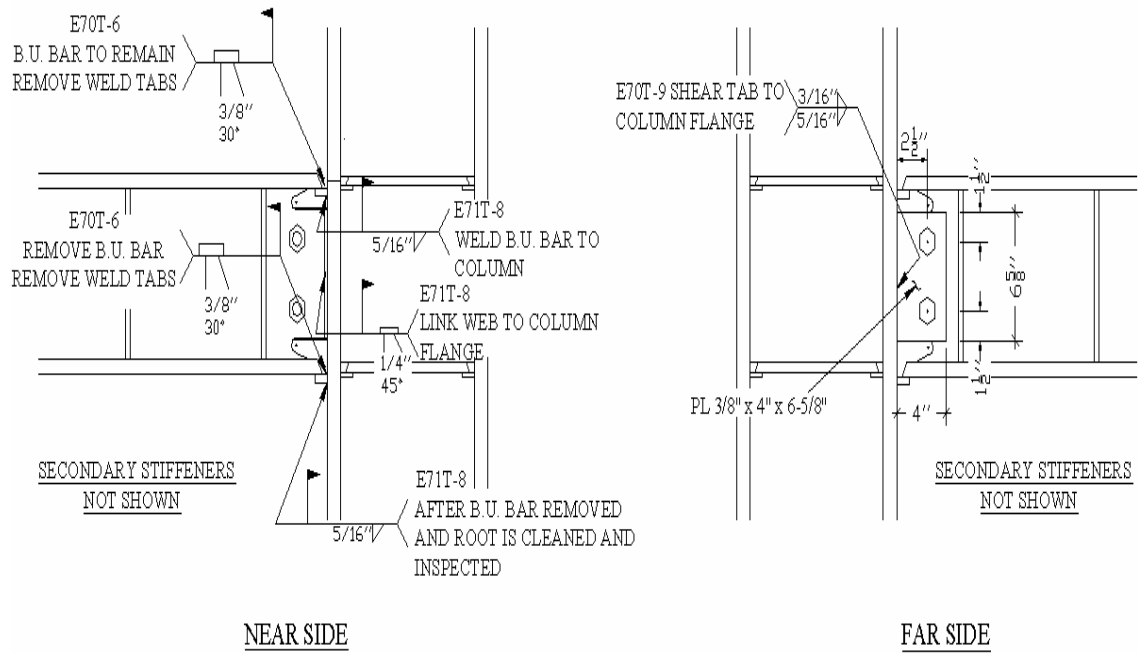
Specimens AISC-6 & 7 – Connection Details
